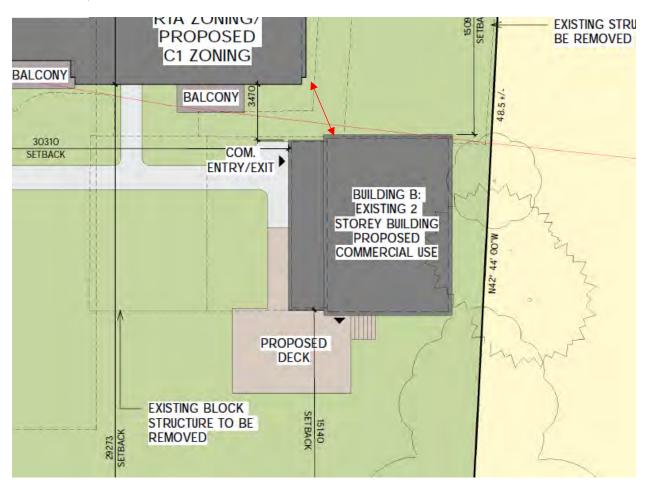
Excerpt of the concept plan for the proposed development as it relates to the existing stone building on-site (Source: Fryett Turner Architects, 2023).
